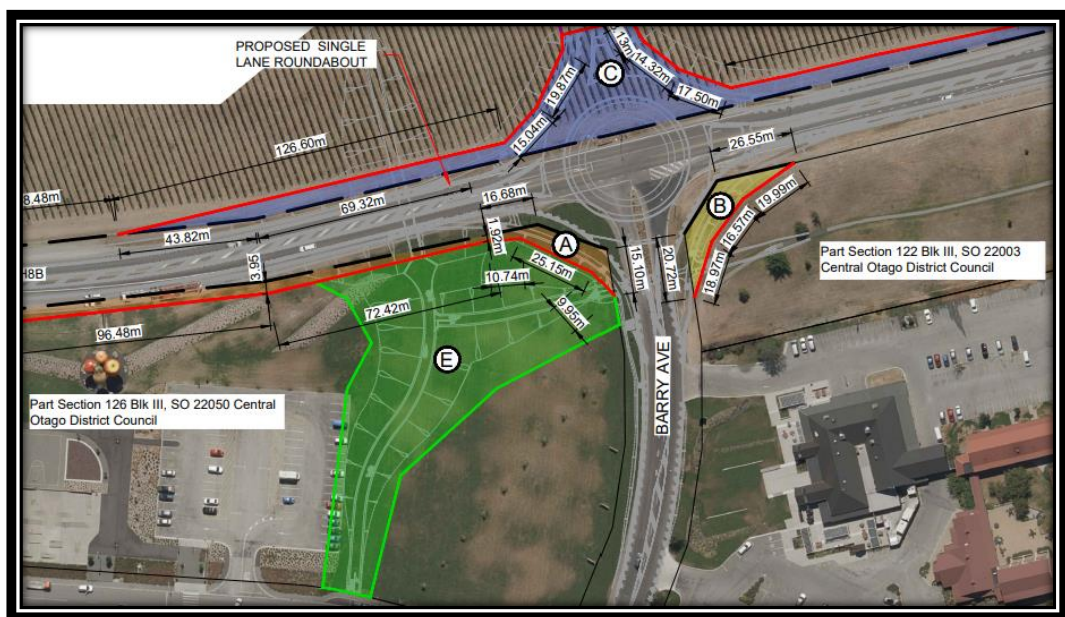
Revised Plan of Works/Land to be Taken from RT OT13B/860
